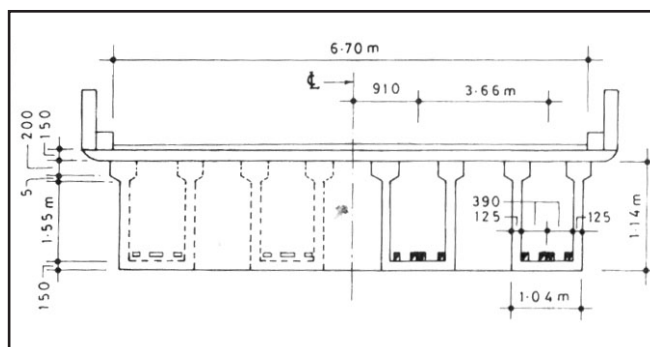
Cross section of the deck of Palar bridge near Chennai.
